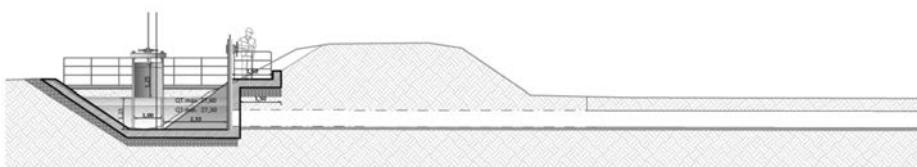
Hydraulic connection between Gaggio-Panzano canal and Canaletta A-B canal – section view PEAD pipe
